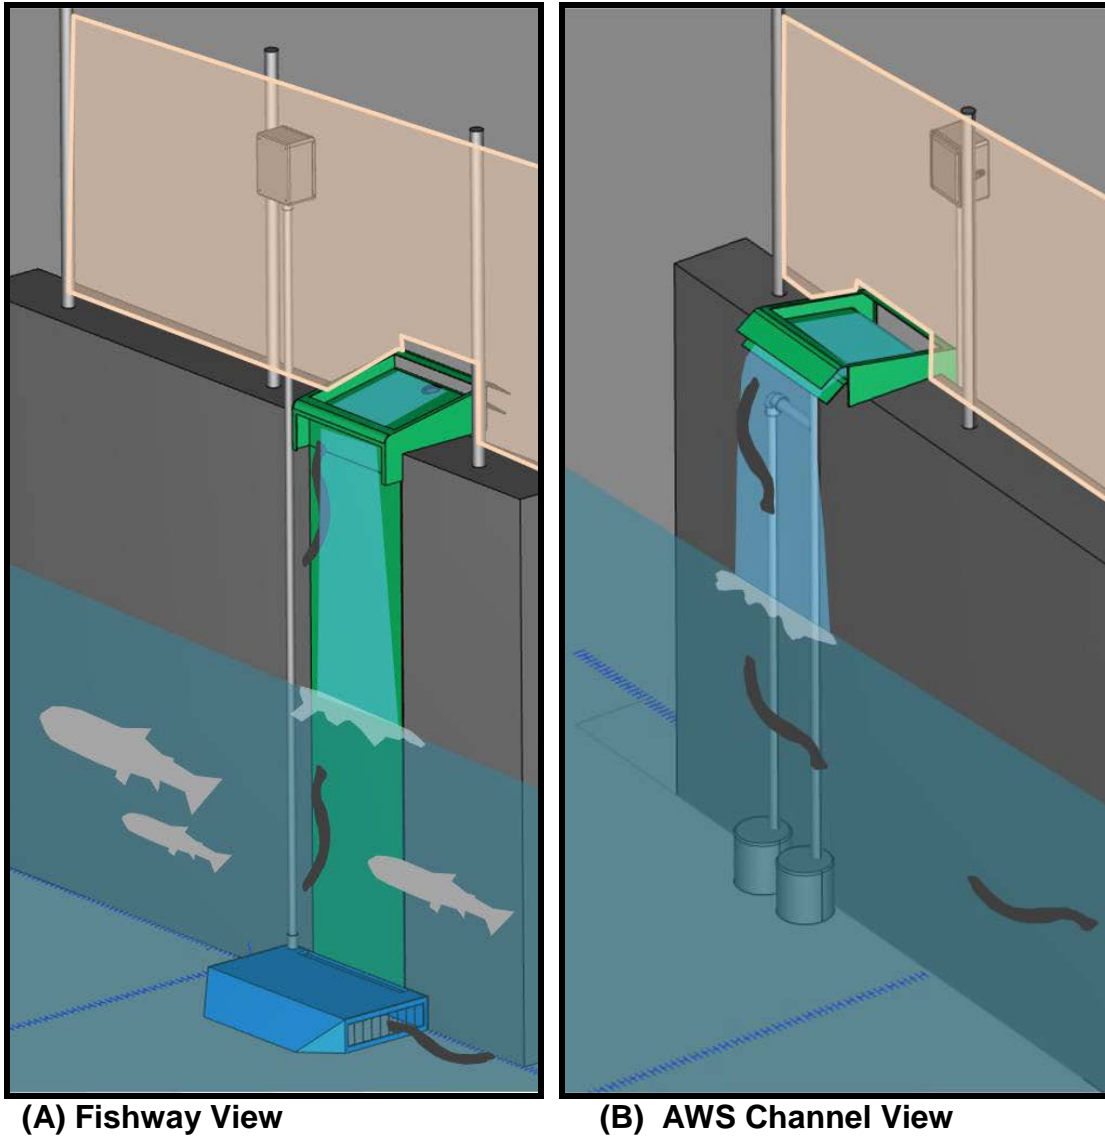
Isometric illustrations of the proposed wetted wall lamprey passage structure (lid on hood box at top of structure omitted in illustration). View (A) depicts the fishway side of the structure, including refuge box, climbing plate, and upstream 1.5" conduit. View (B) depicts the AWS channel side of the structure, including exit crest and two 115V submerged pumps. Water may be supplied via a nearby spigot instead (pending verification from Bonneville Project staff).
